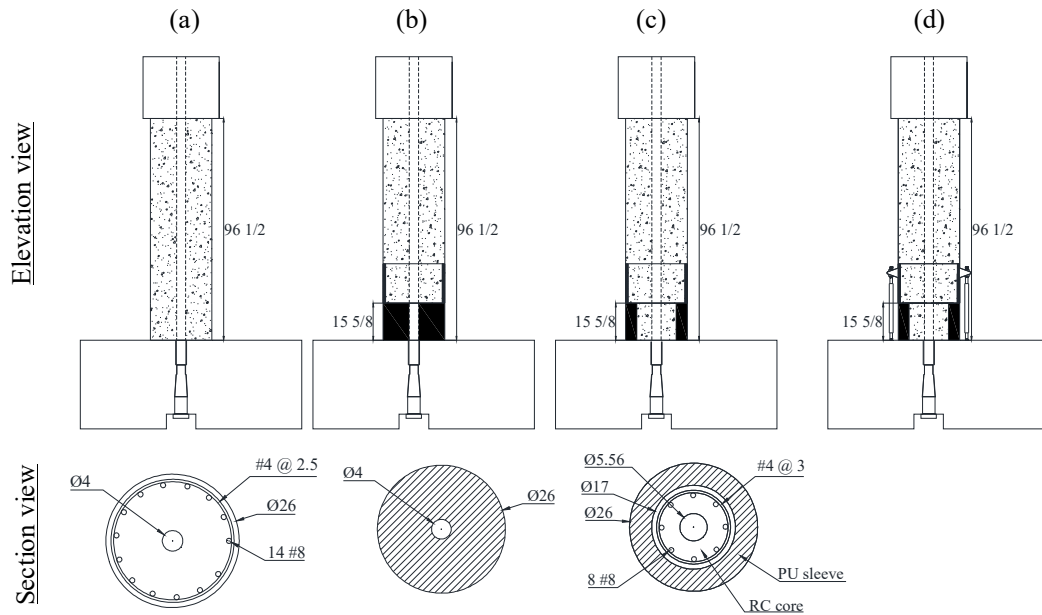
Schematic view of test specimens: (a) RC rocking column; (b) rocking column with solid PU end segment; (c) rocking column with bi-layered PU end segment; (d) rocking column with bi-layered PU end segment and ED Links (All dimensions are in inches. Section views are for the base section at the foundation level. ED links are not shown in section view).
